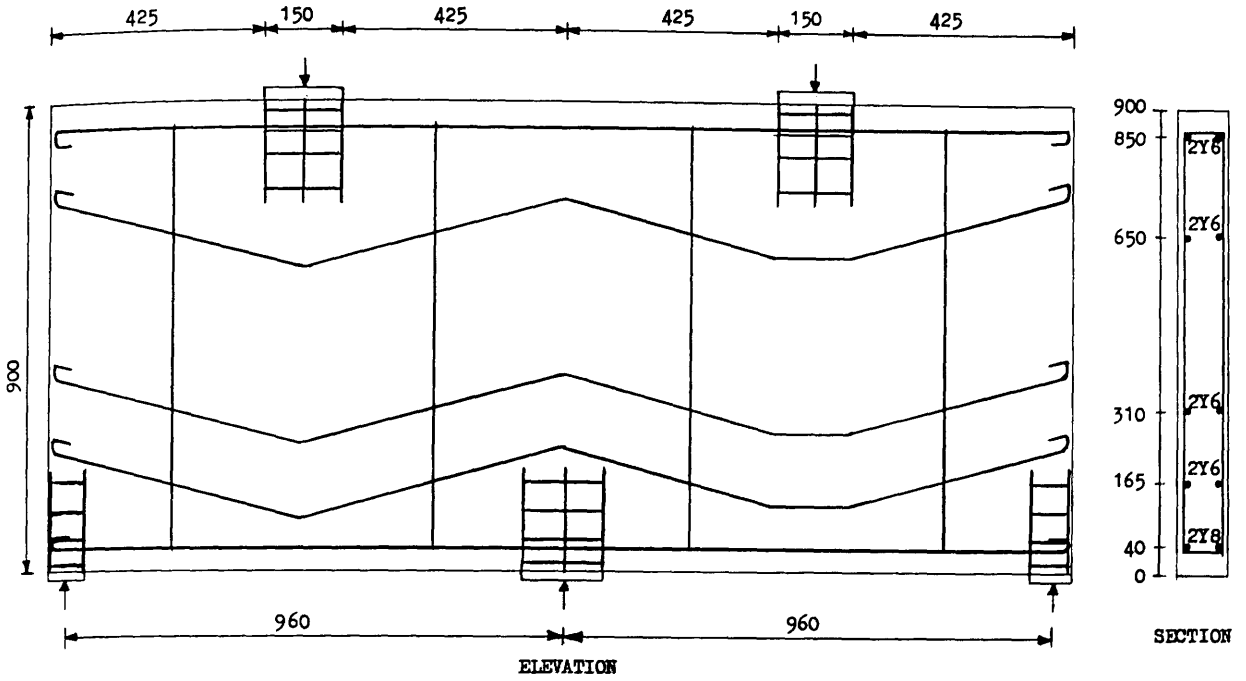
Dimensions and reinforcing details of girder TRGRAS4
